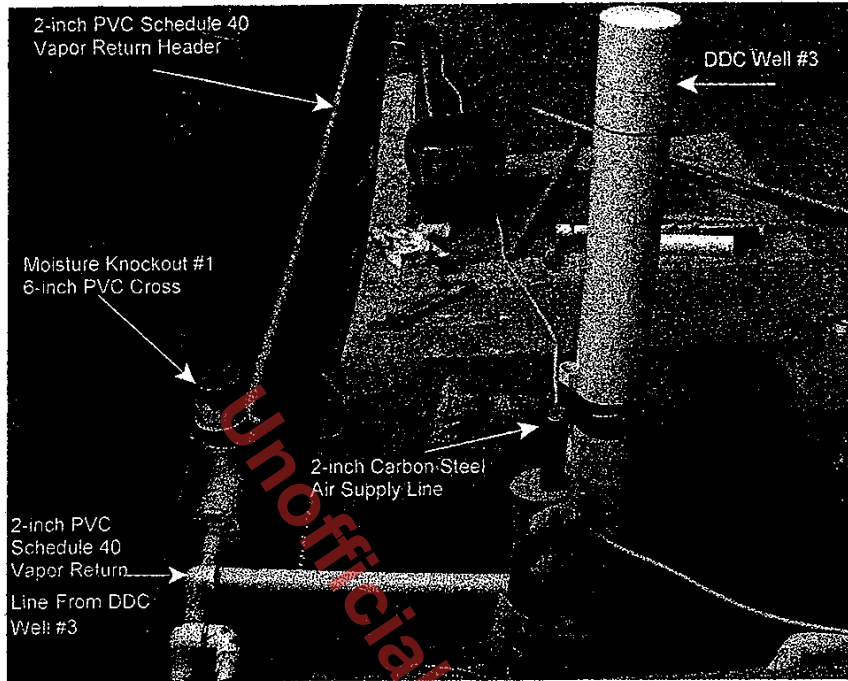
As Built Details For Trenches and Moisture Knockouts
